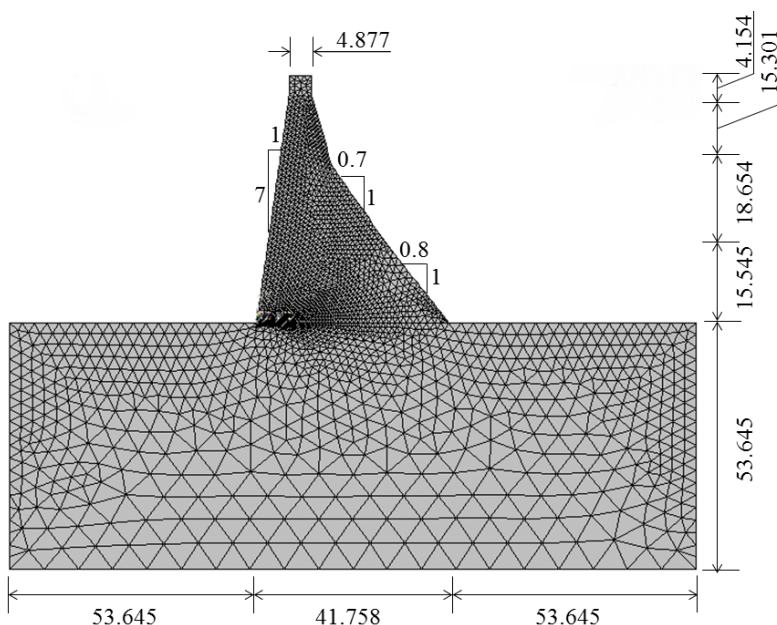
Finite element model of the Greyrock gravity dam and foundation (unit: m).
